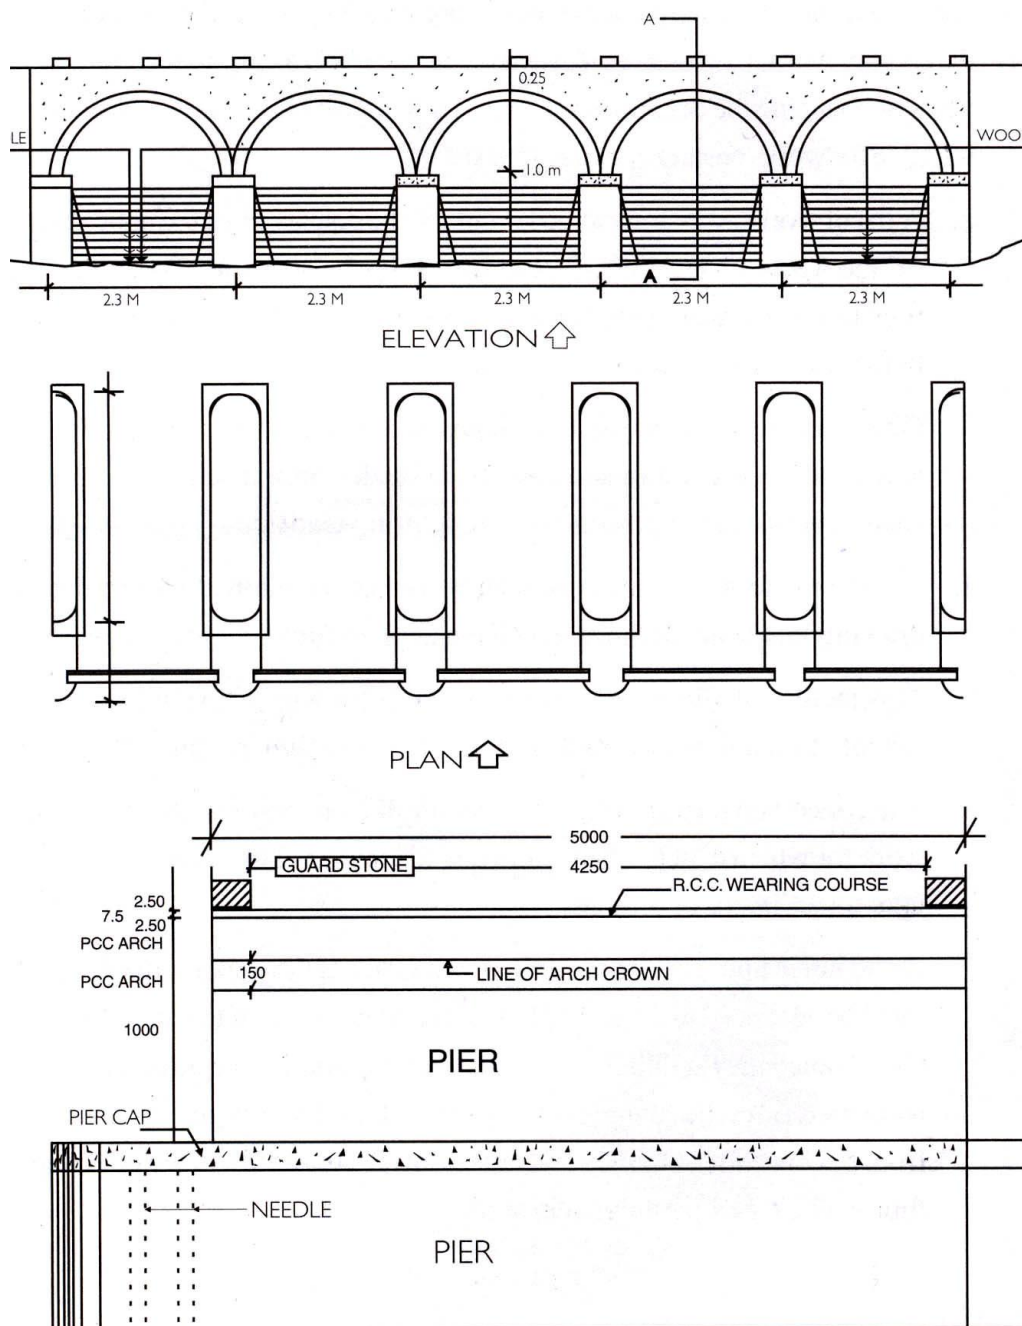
Typical sketch of a Bridge-Cum-Bandhara
